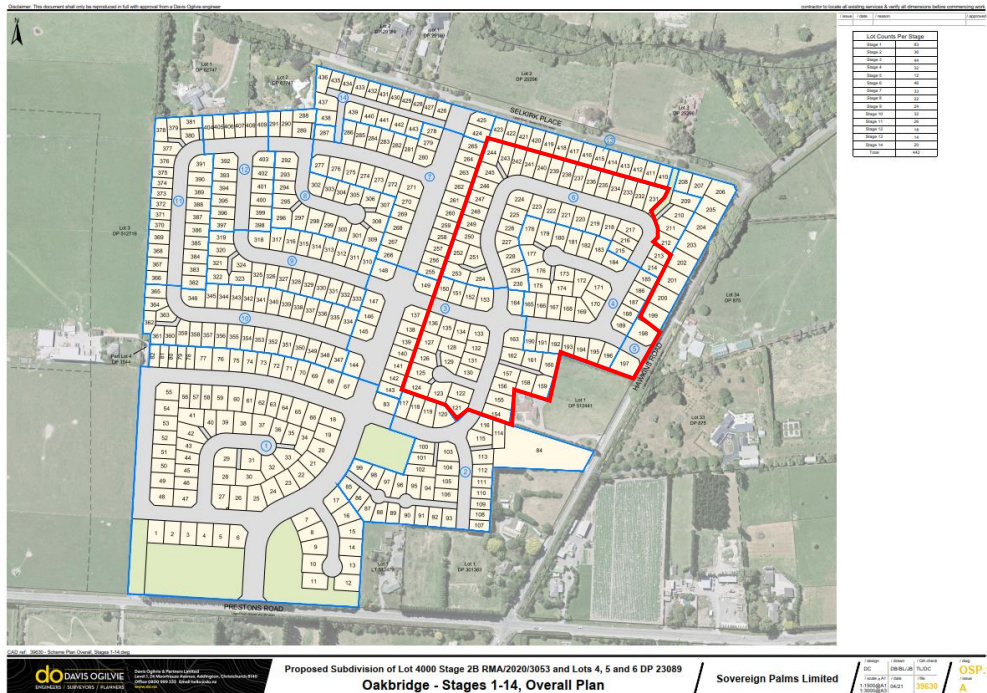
Overall plan, stages 3, 4 and 5 outlined in red
